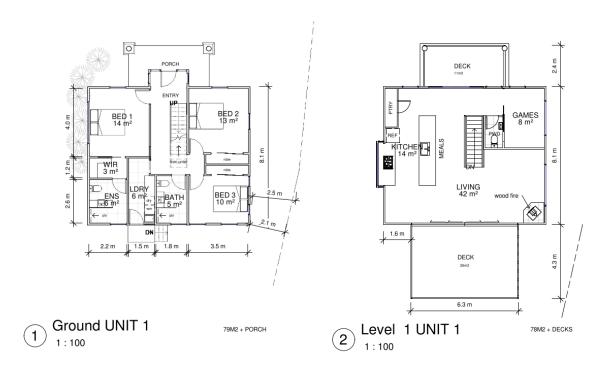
Shows the dwelling 1 (unit 1) floor plans.
